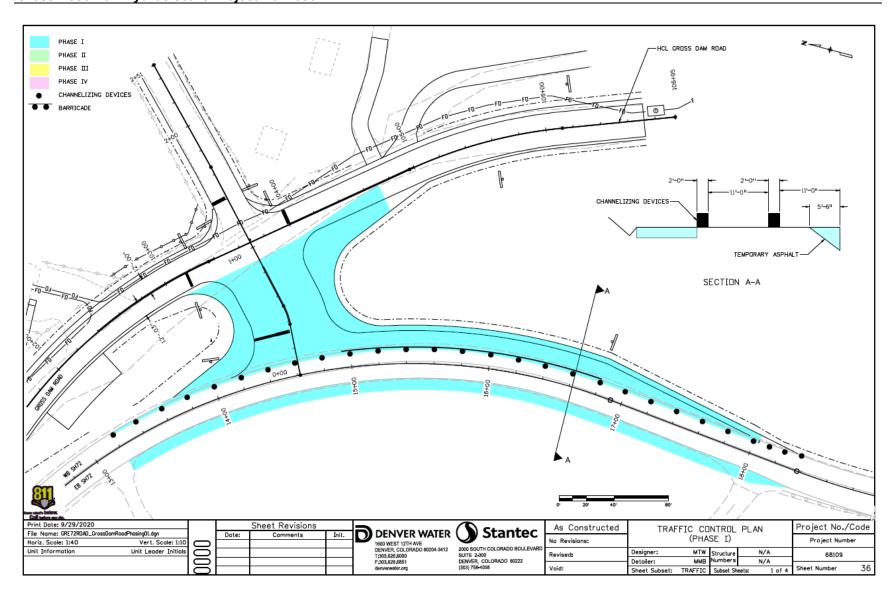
Gross Dam Road and SH 72 Intersection — Phase I
